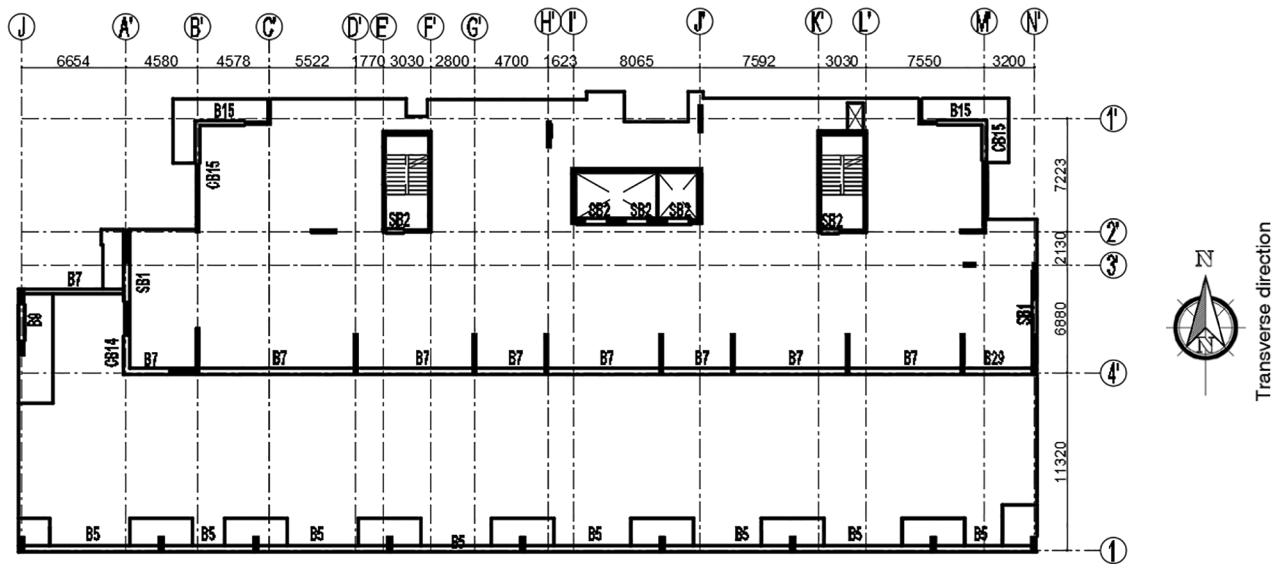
Plan view of the overall framing layout for the basement and ground floor
